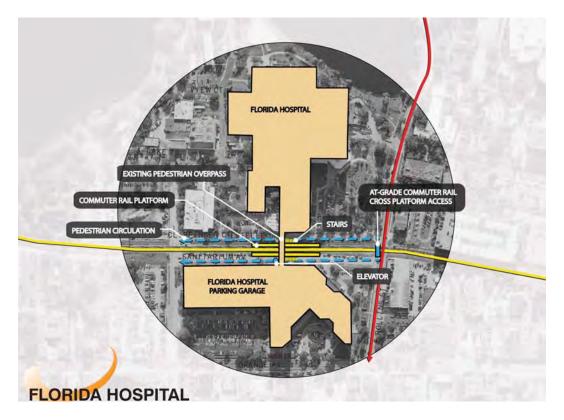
Conceptual Station Site Plan – Florida Hospital
